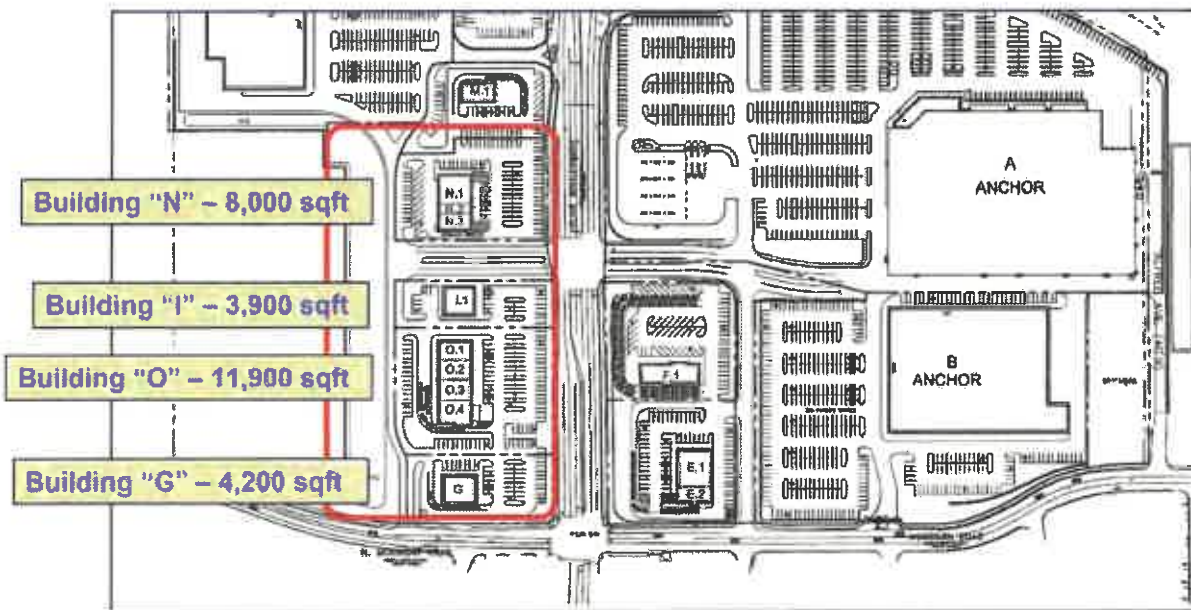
Proposed building sizes for development at the southwest corner of Olive Boulevard and McKnight Road.
